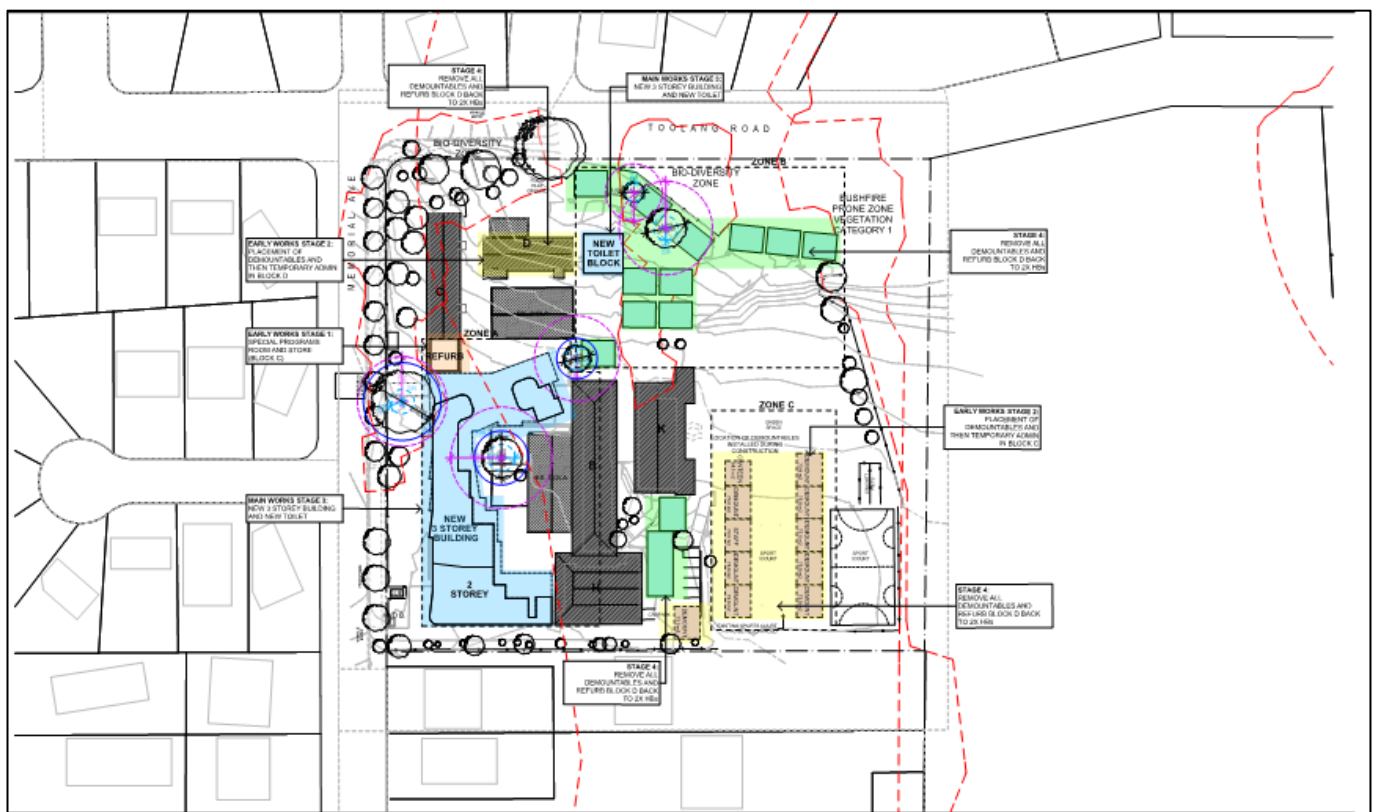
Proposed site plan – Staging (JDH Architects, Schematic Design S.1, dated 31 August 2018)
